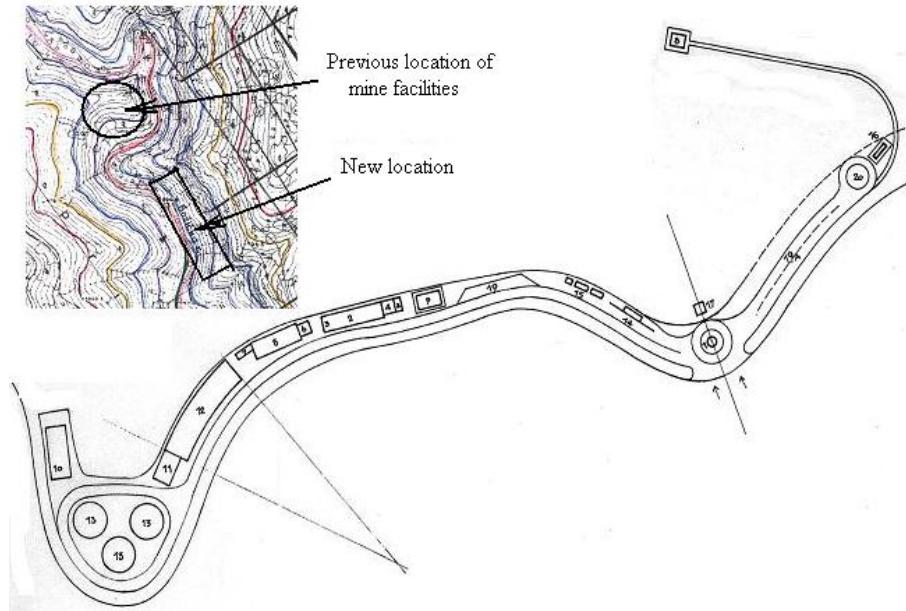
Layout of the mine facilities on the surface, the newly proposed location
